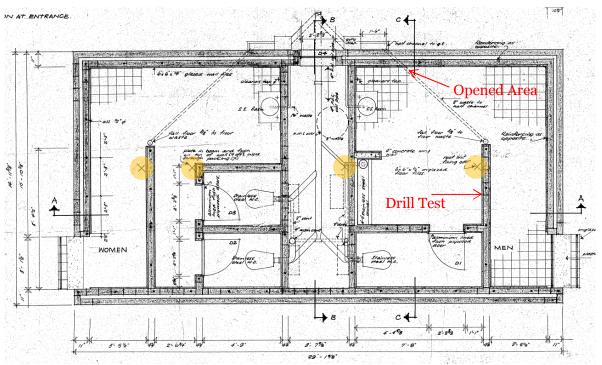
Wall plan of the toilets highlighting indicative locations of roof fixings.
